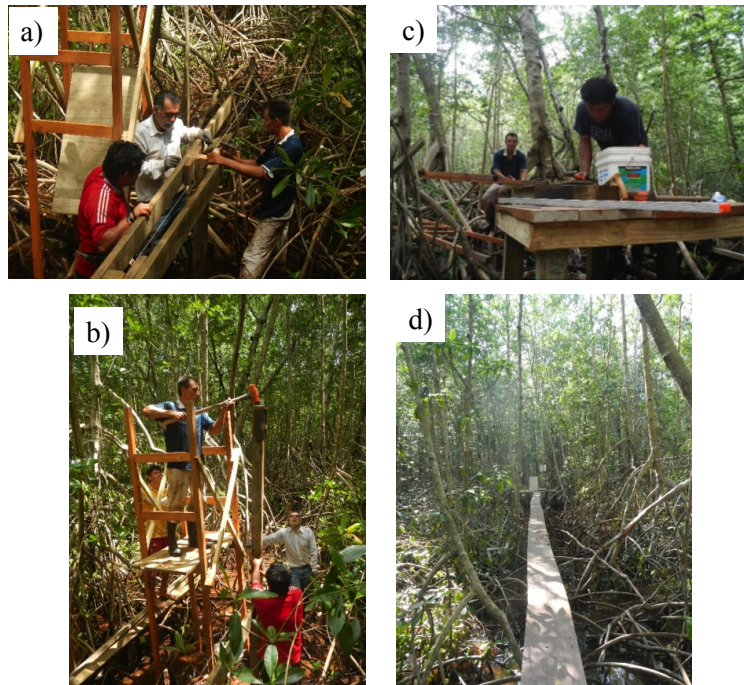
Main steps of boardwalk installation at La Encrucijada, a) posts and supporting structure, b) anchoring posts, c) cover installation, and d) finished product.
